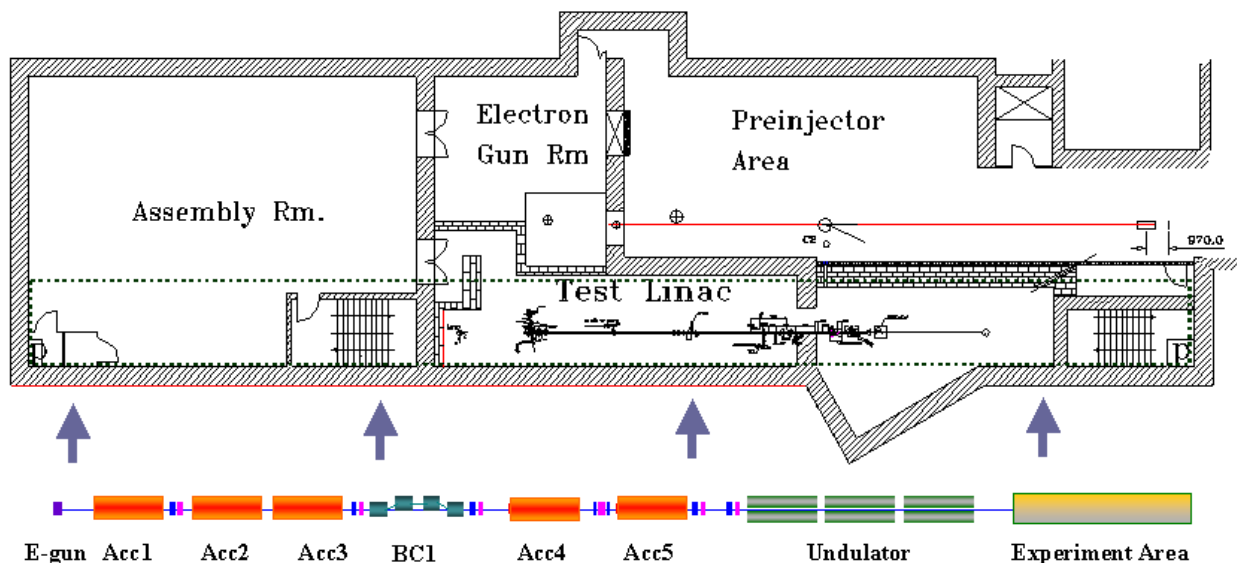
Drawing with preinjector area in the linac building and schematic layout of the test machine. The test machine is designed to install in the dashed block.
